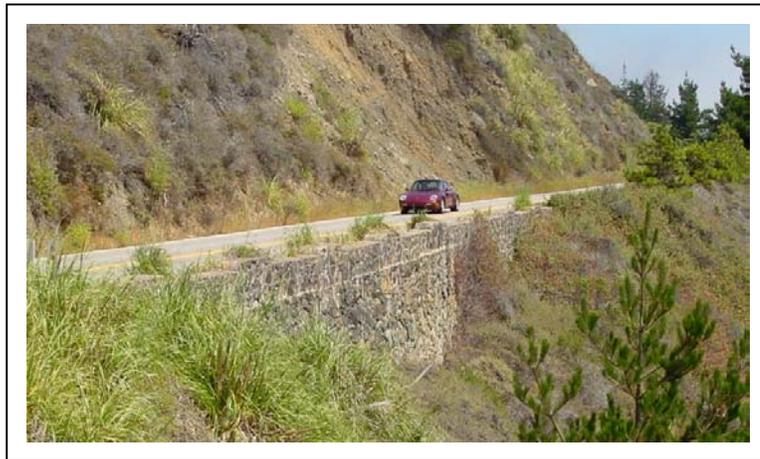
A stone masonry retaining wall topped by a castellated type of stone parapet, typical of the historic stone work along Highway 1.
